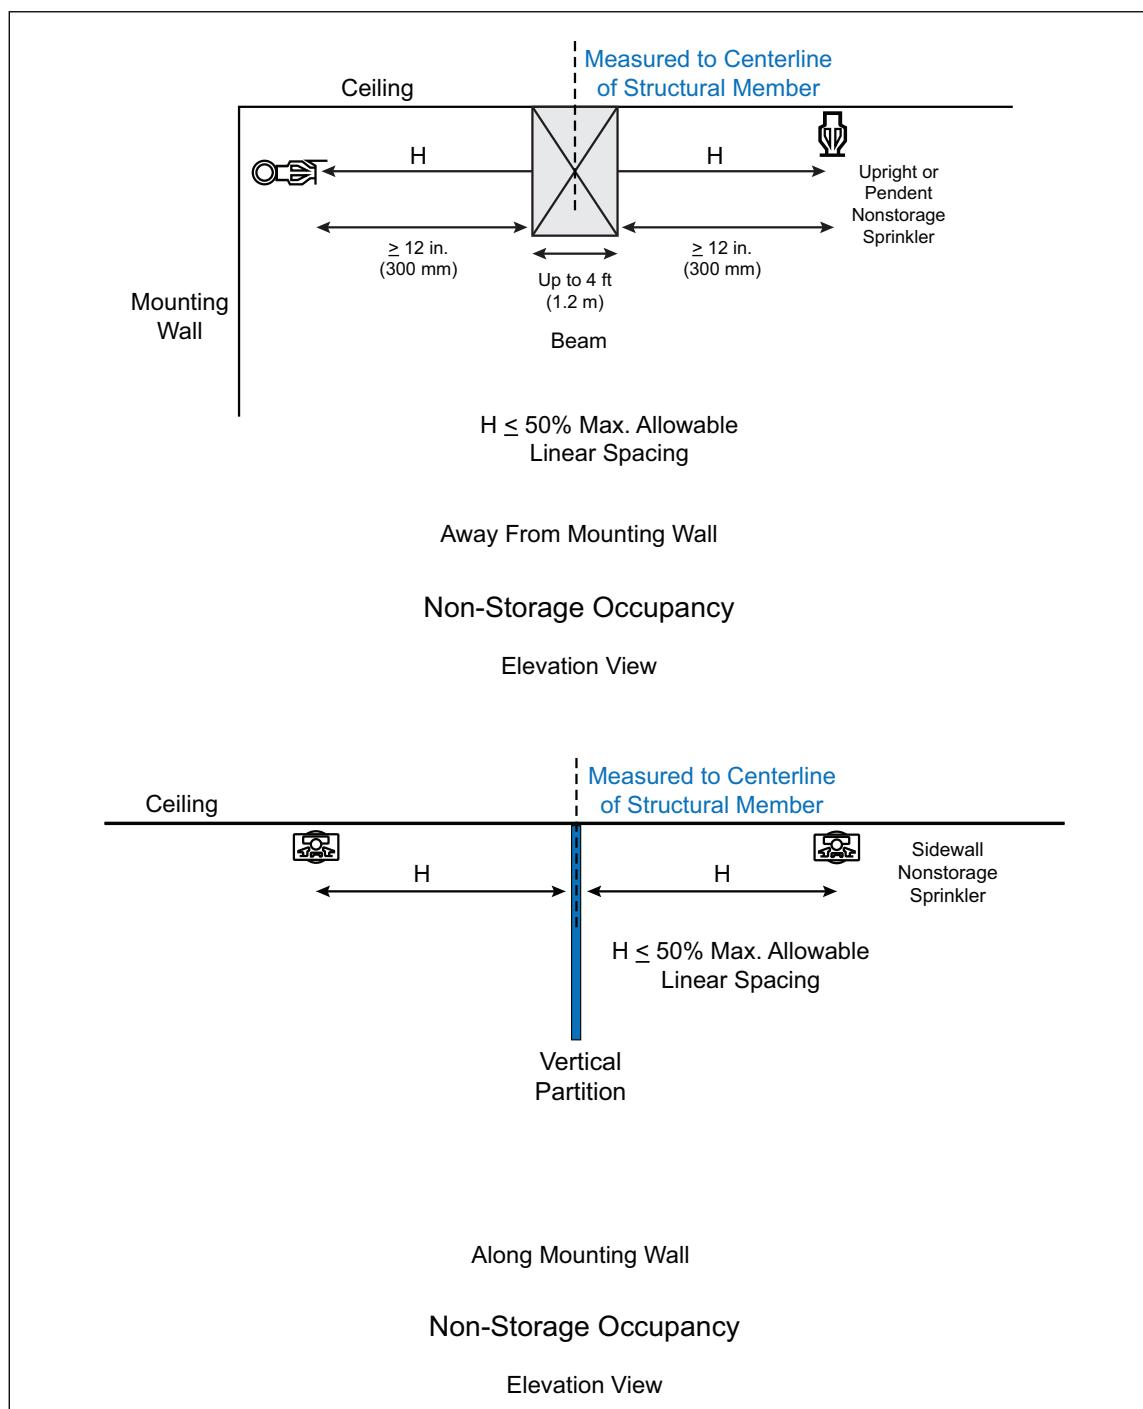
(b). Positioning ceiling-level sprinklers when ceiling structural members obstruct sprinkler discharge
